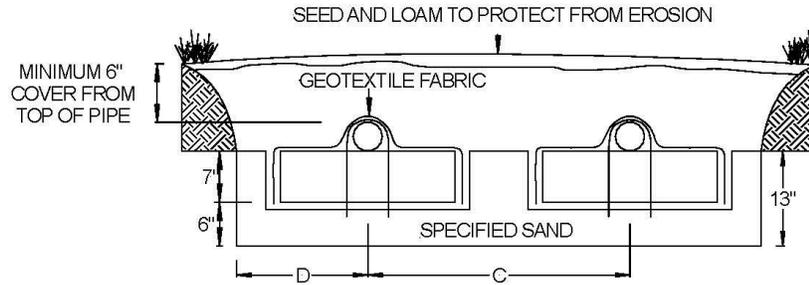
SECTION VIEW – 3 LATTERAL BED SYSTEM
